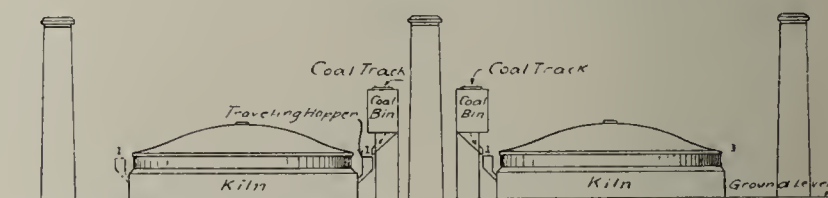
Elevation of Kiln Arrangement, Plan of Which Was Shown in Previous Illustration.
